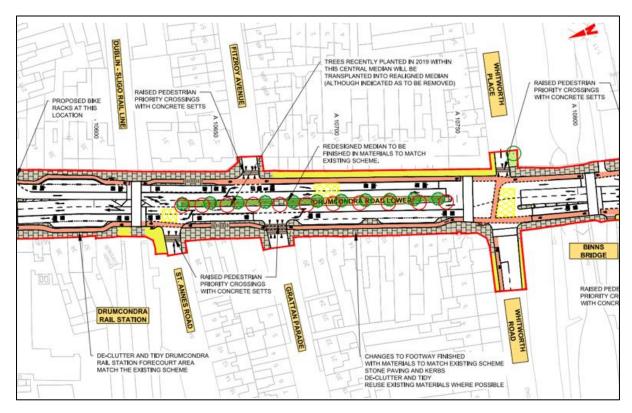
Proposed Landscape General Arrangement at the Drumcondra Road Lower (Sheet 33)
